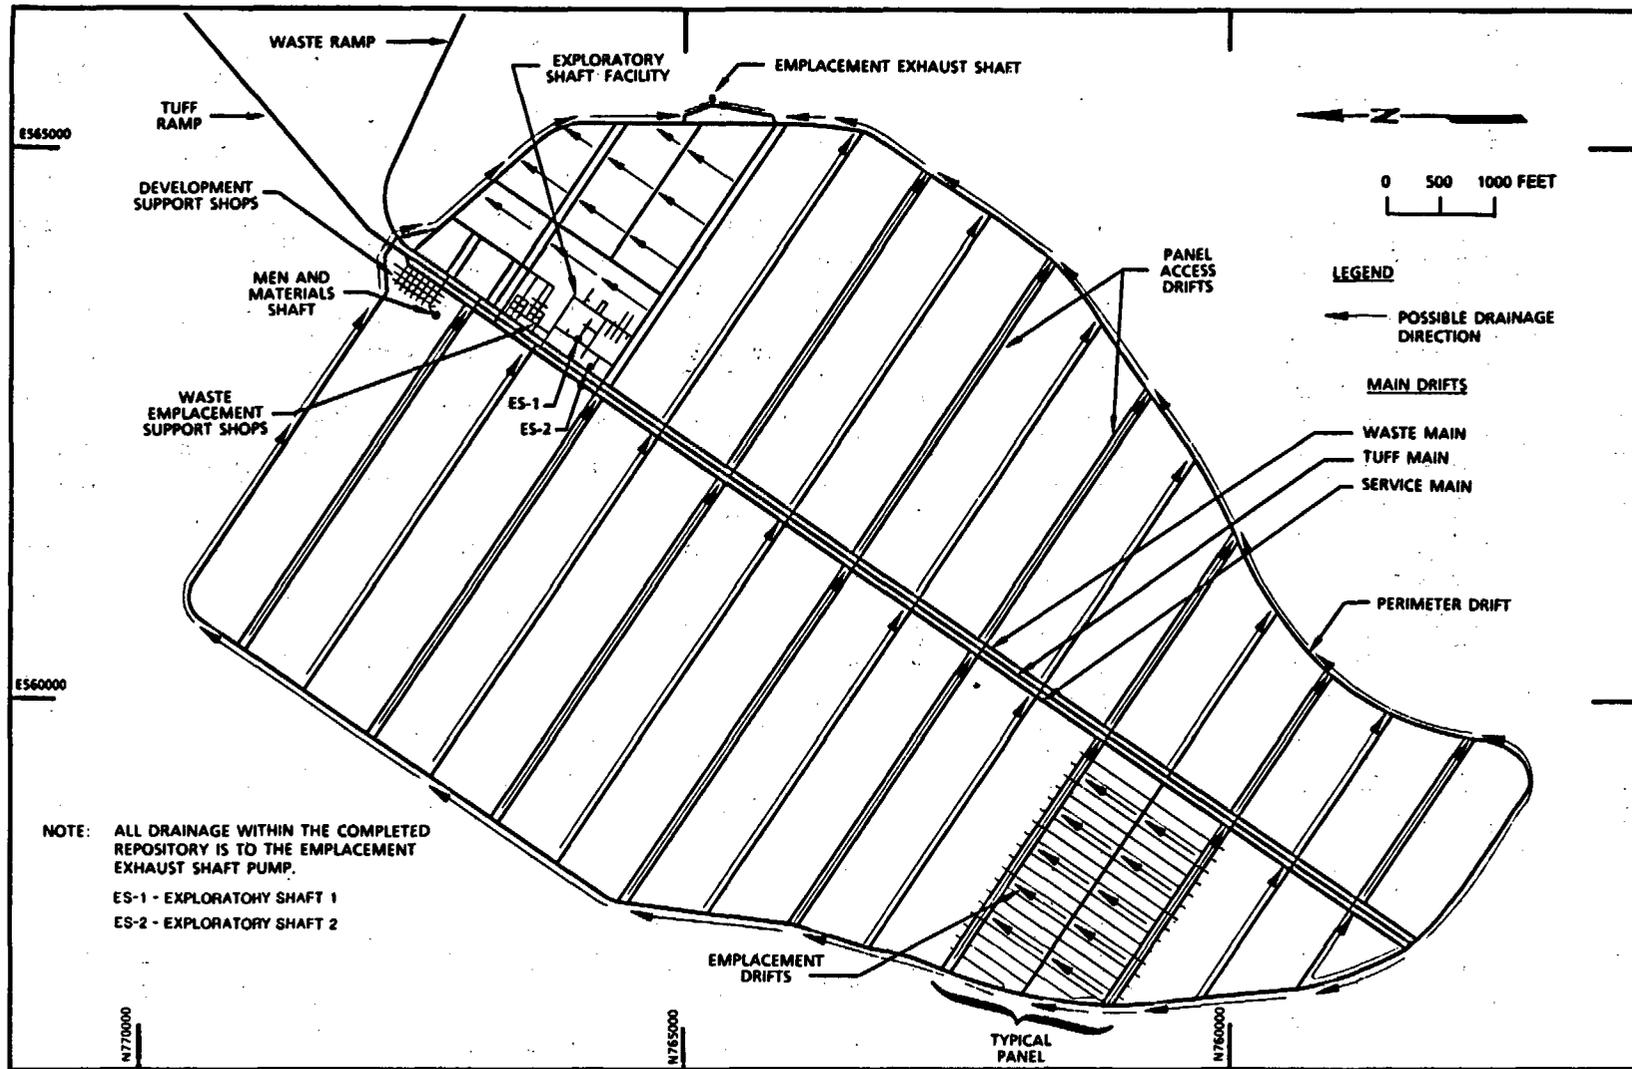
General underground facility layout showing drainage directions for vertical emplacement.
